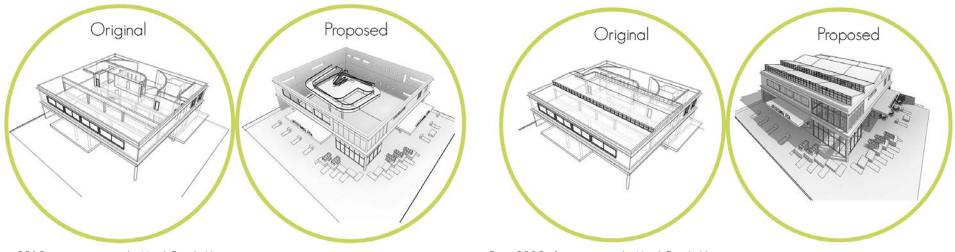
Ramp intervention to the Minty's Tyres building.
